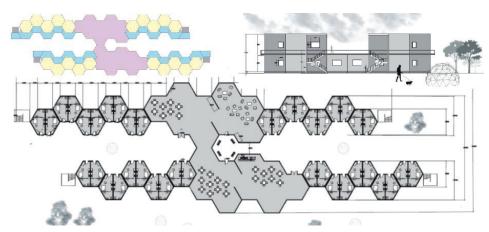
Scheme of first floor, plan section-first floor, elevation Source: Gabin Peinado 2017.
